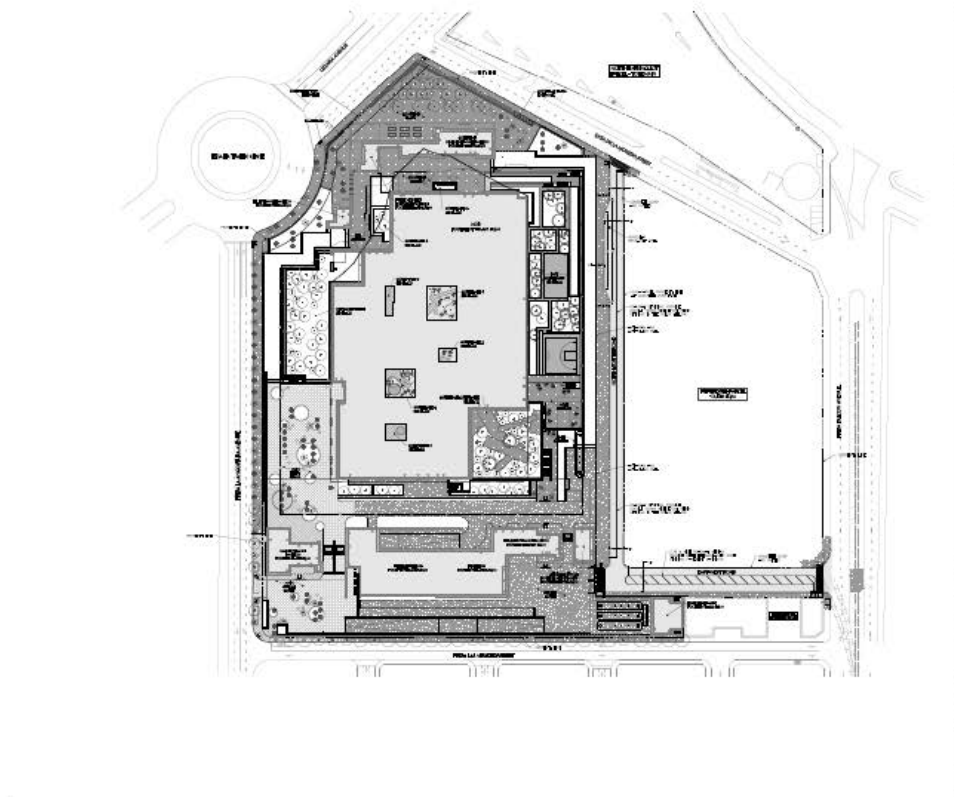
Site Plan for New Embassy in Mexico City, Mexico
